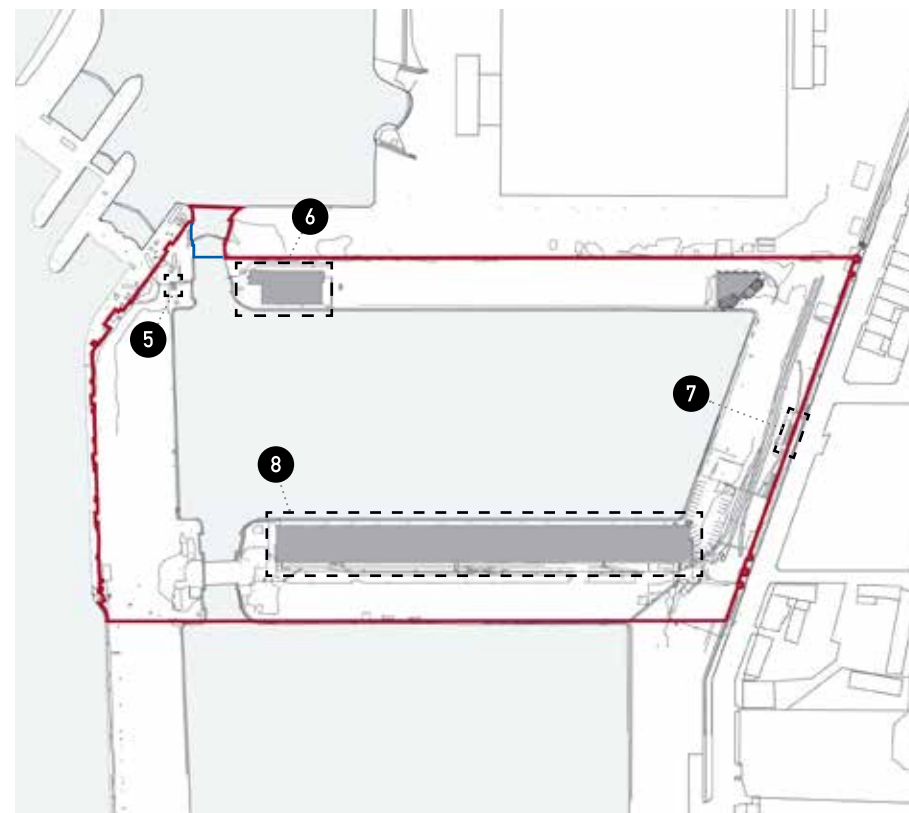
Existing site plan showing existing site buildings, application site boundary line (in red) and ownership line (in blue)
